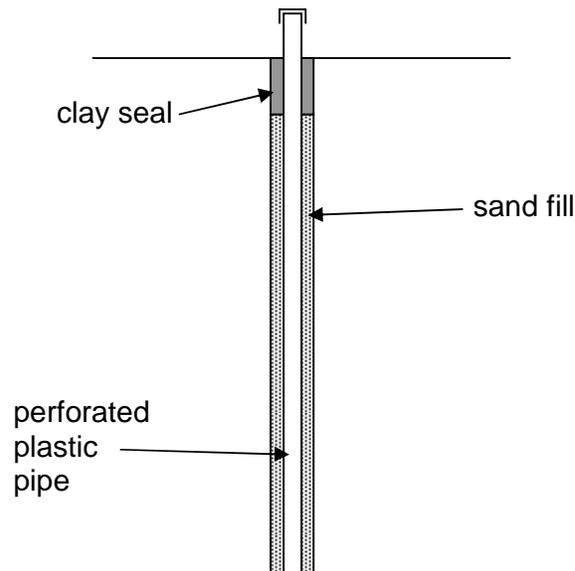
Cross section of typical shallow pipe well installed at each willow planting sites
